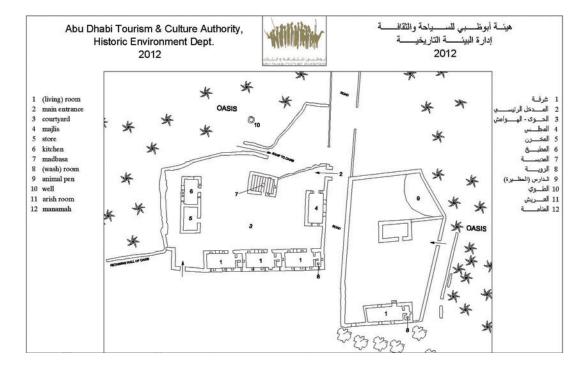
The typical layout of twentieth-century vernacular earthen buildings in Al Ain. *Source:* Peter Sheehan, DCT.
